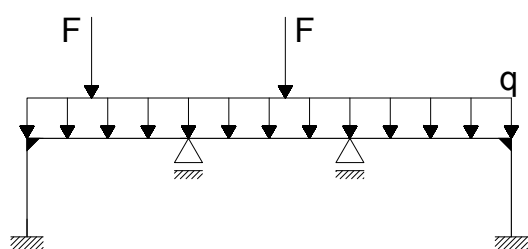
Internal floor model 2 with fixed web-to-lower-flange connection
